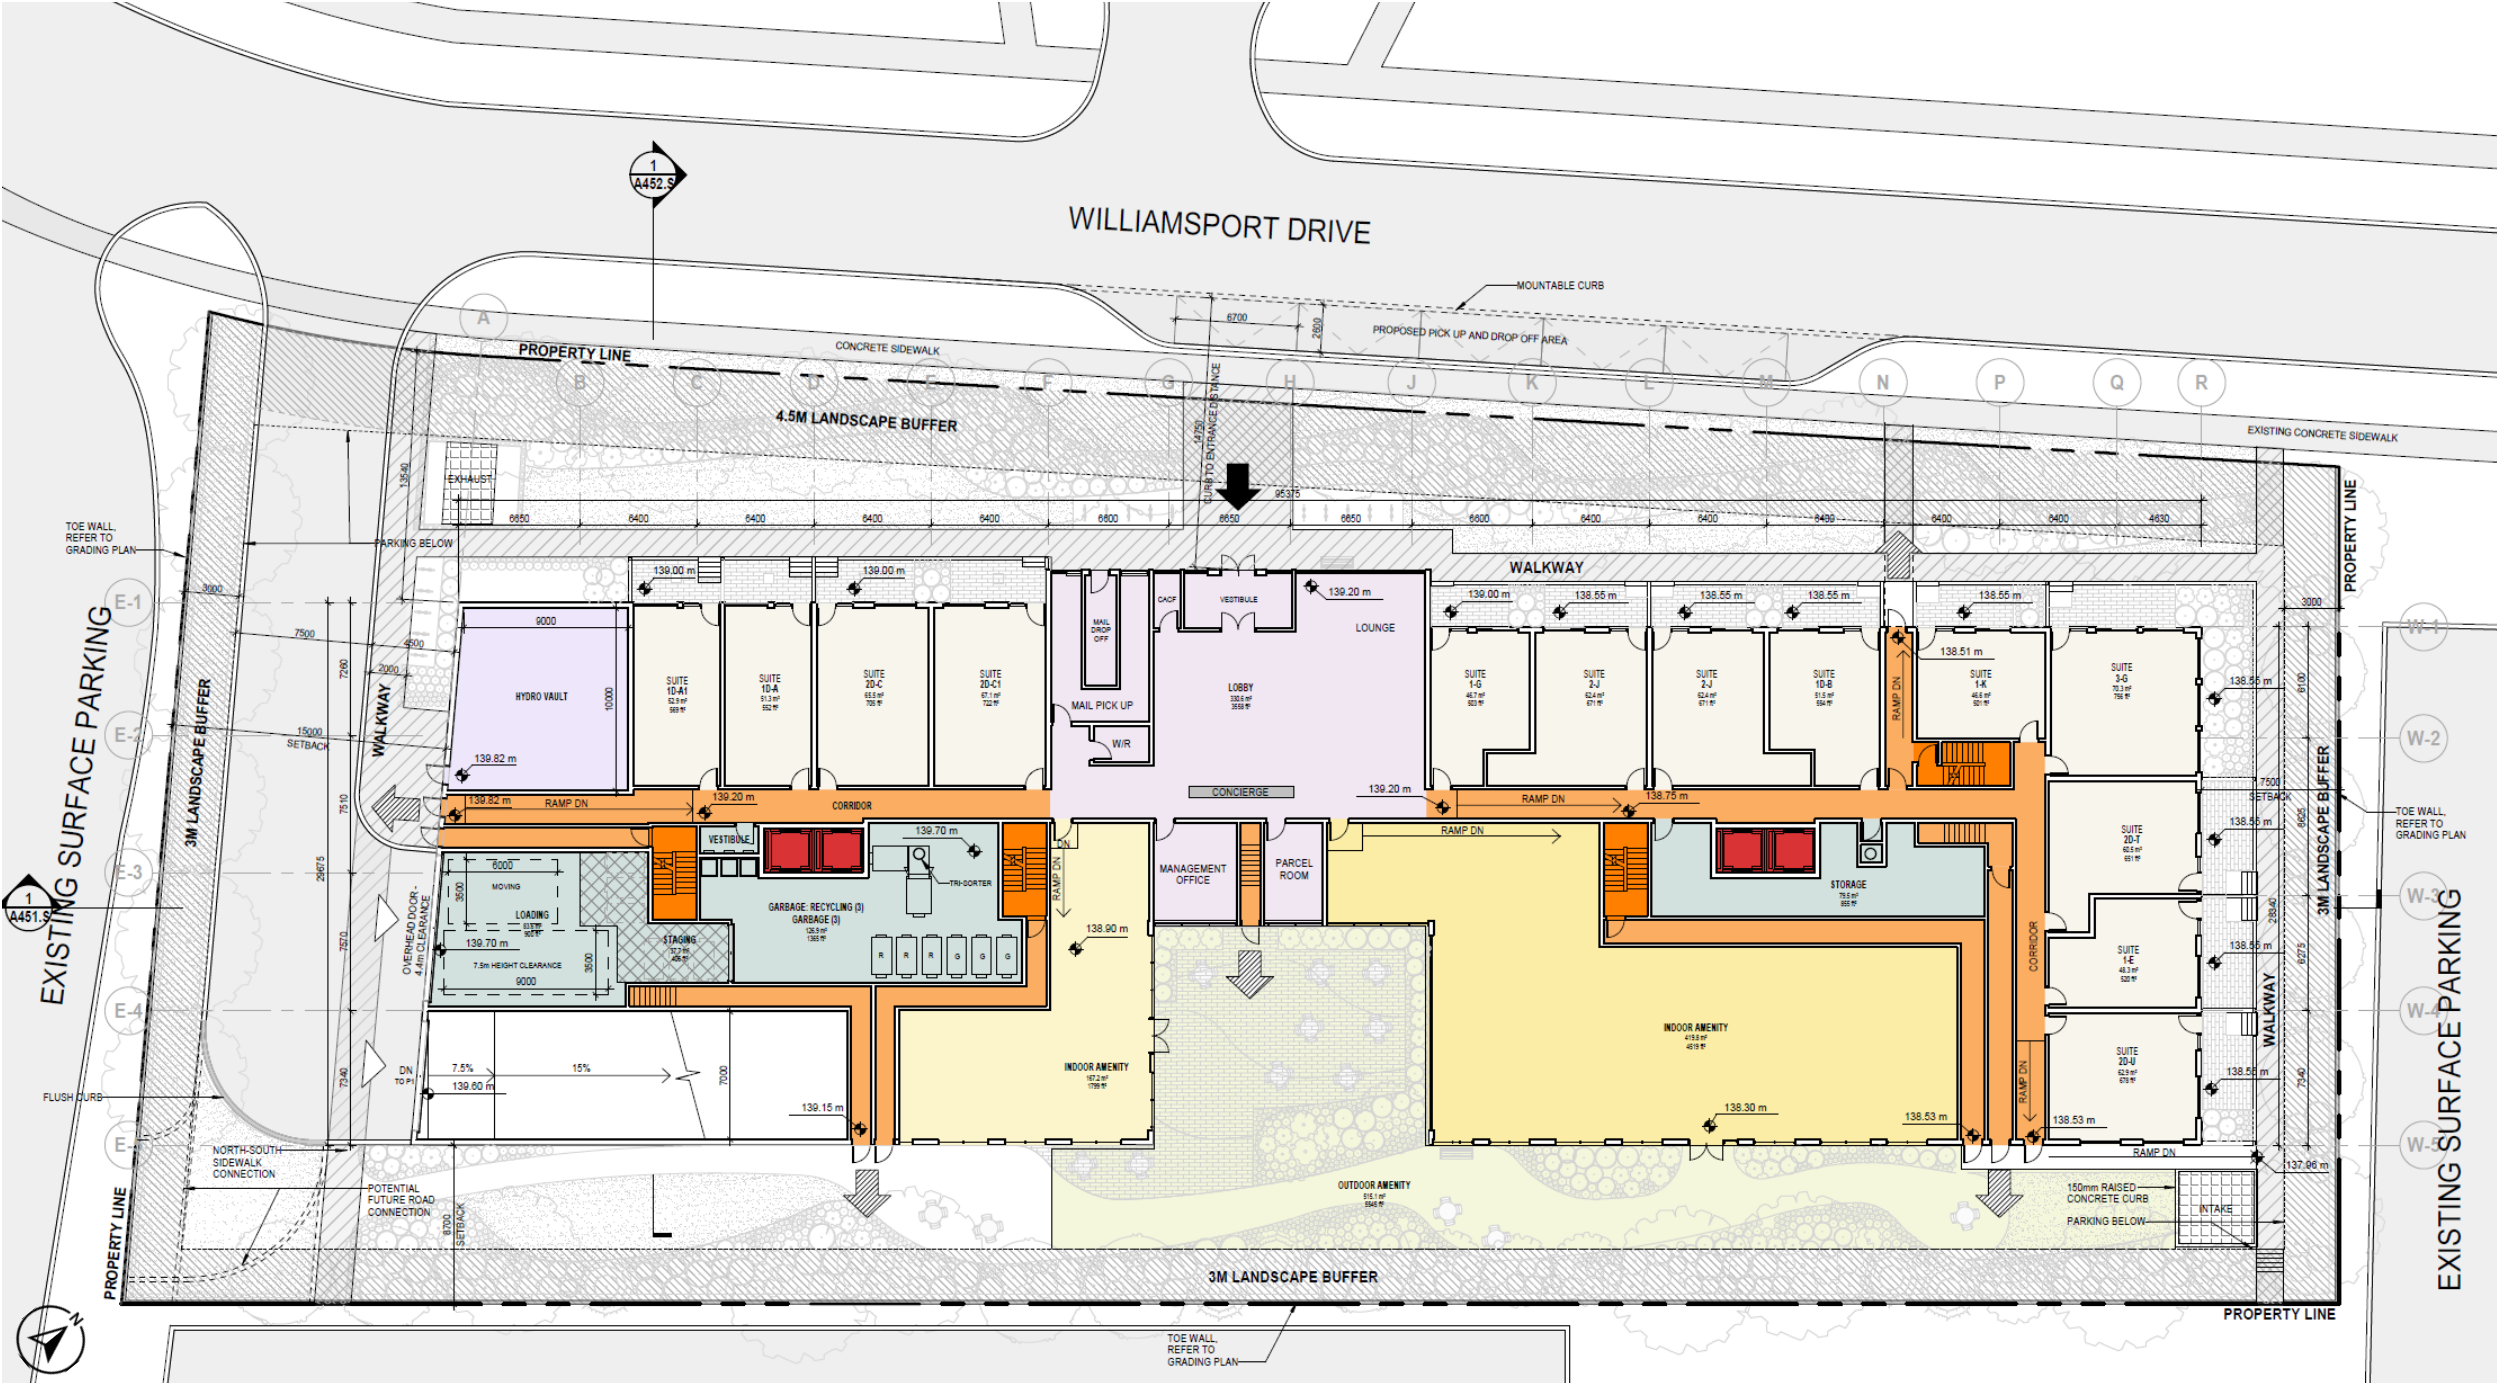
Ground floor plan (Source: BDPQ Architects)
